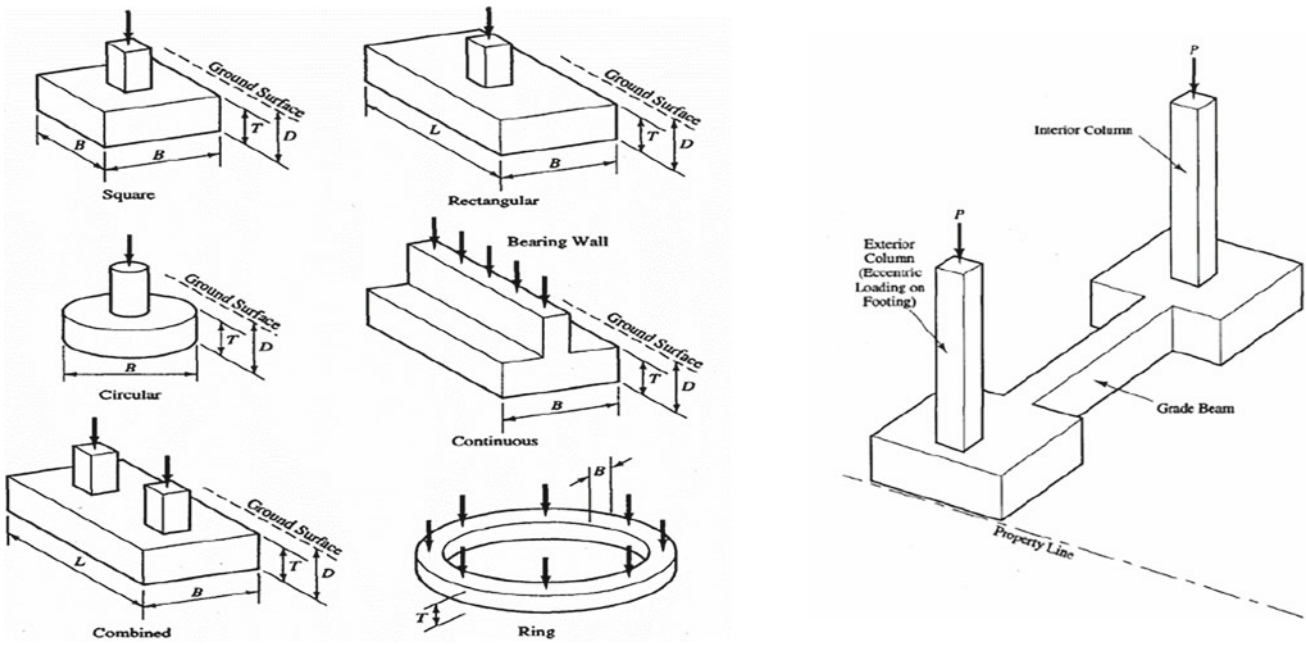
Spread footing and strap footing foundation. Source SNU Geotechnical Engineering 2019
